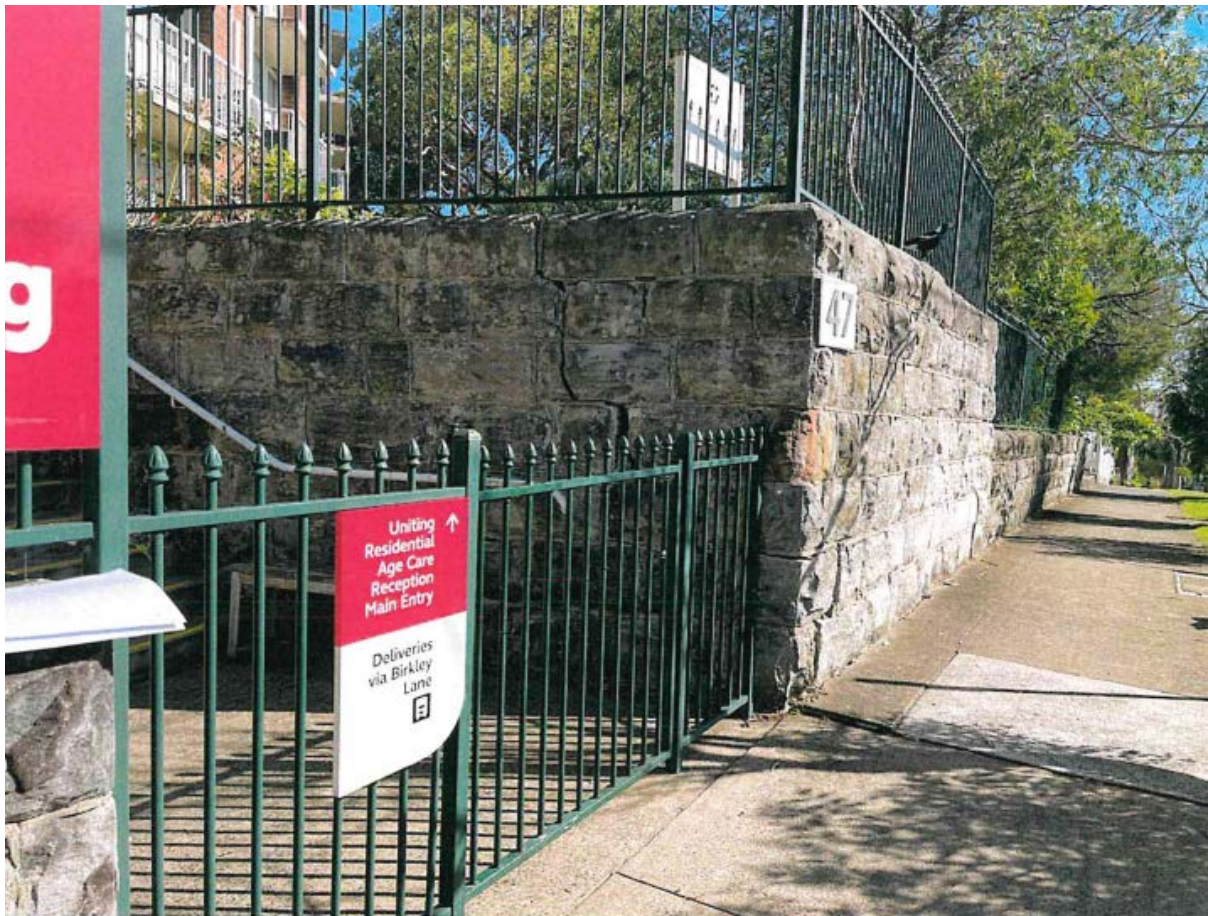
View of Works Area A from Birkley Road (following tree removal).
